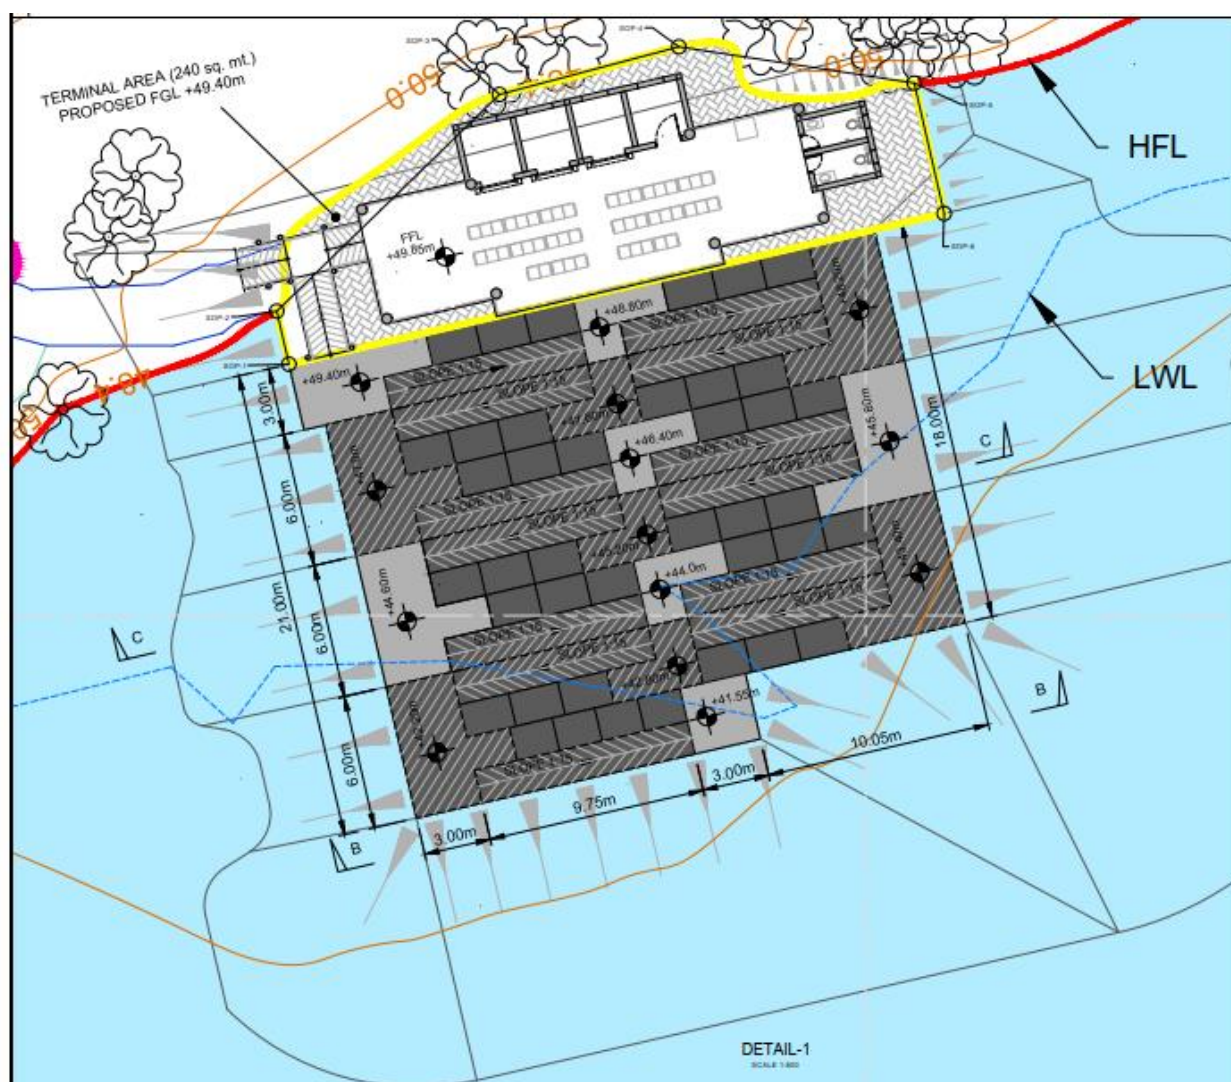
Layout of proposed modular ferry terminal at Umananda location
